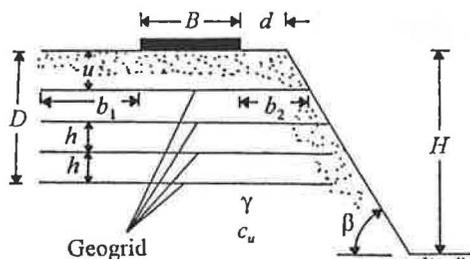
Geometric parameters for a surface strip foundation on geogrid-reinforced clay slope
